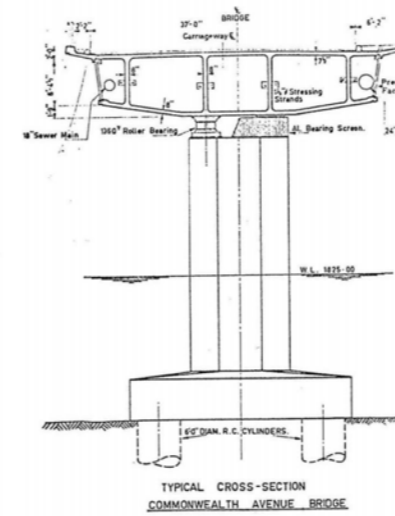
Commonwealth Avenue Bridge design with slender piers and wider precast box segment, post tensioned superstructure.
